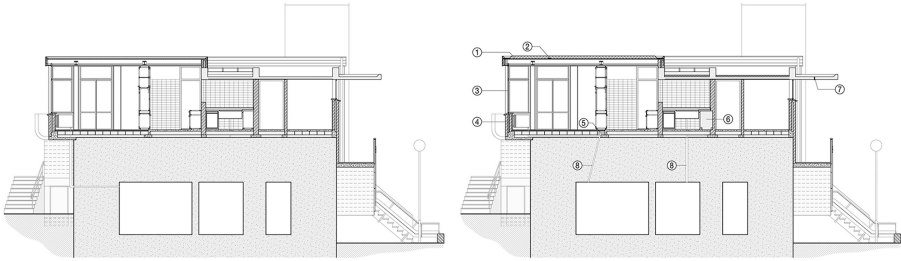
Cross-section (existing/new situation): 1: 120 mm PIR thermal insulation, 2: PVC tubes for alarm and sound system wiring, 3: Low-iron double glazing with powder coated spacer, 4: 60 mm graphite EPS beads in cavity wall, 20 mm aerogel cladding behind radiator, 5: Insulated thermal heating pipes under existing cupboard, 6: New dishwasher, recessed in existing brickwork, 7: Copper pipe to detect possible leakage, 8: New boreholes in bunker roof (© Steven van der Goes)
